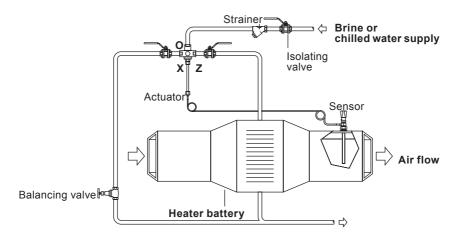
As a diversion valve - Cooling - Brine or chilled water
